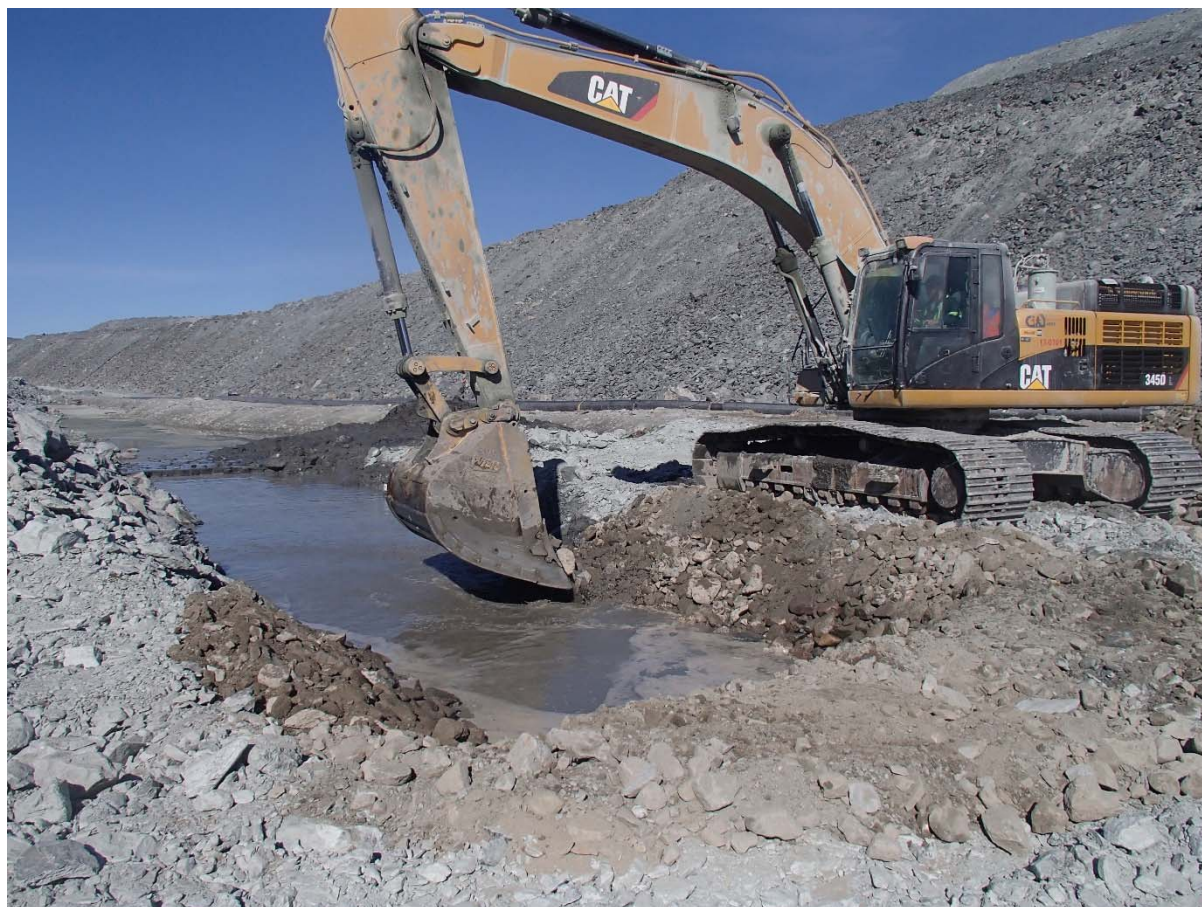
From Sta. 1+500/-37 m (approx.), looking S. View of a deposition point.
